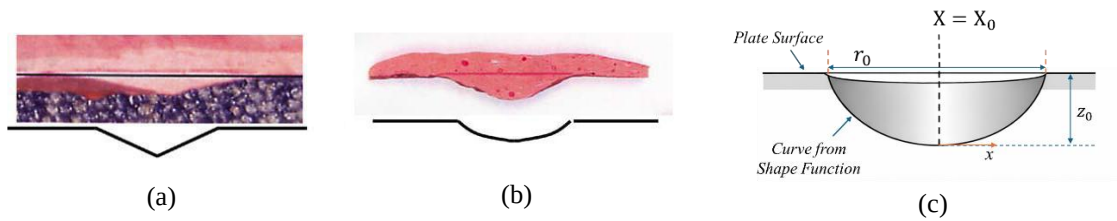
Cross sectional view of corrosion pit: (a) circular cone shape pit; (b) ellipsoidal shape pit; (c) illustration of shape function parameters
